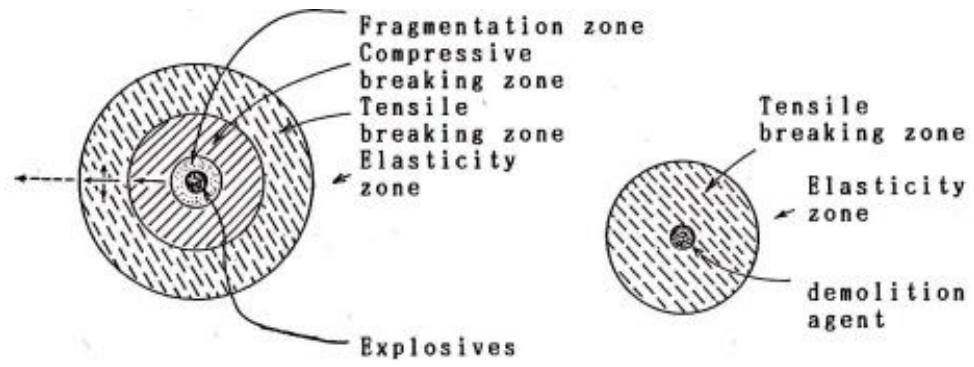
Demolition mechanism of bursting with non-explosive and explosive
